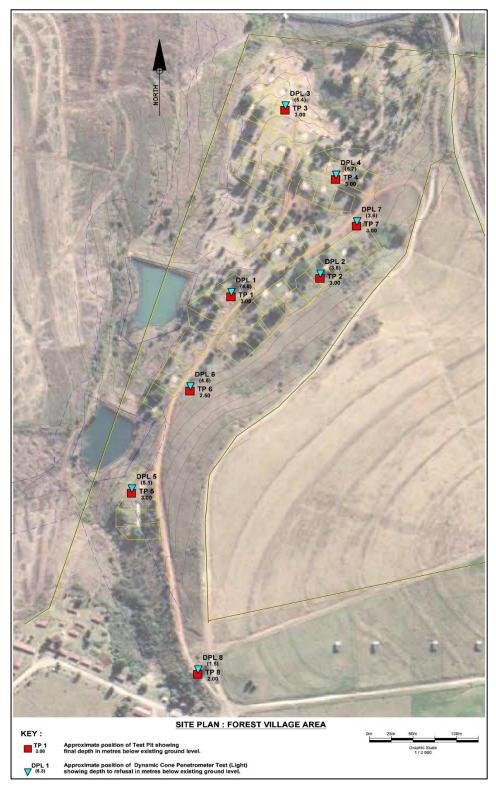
Site Plan showing test pit and DPL test positions in the Forest Village Area
